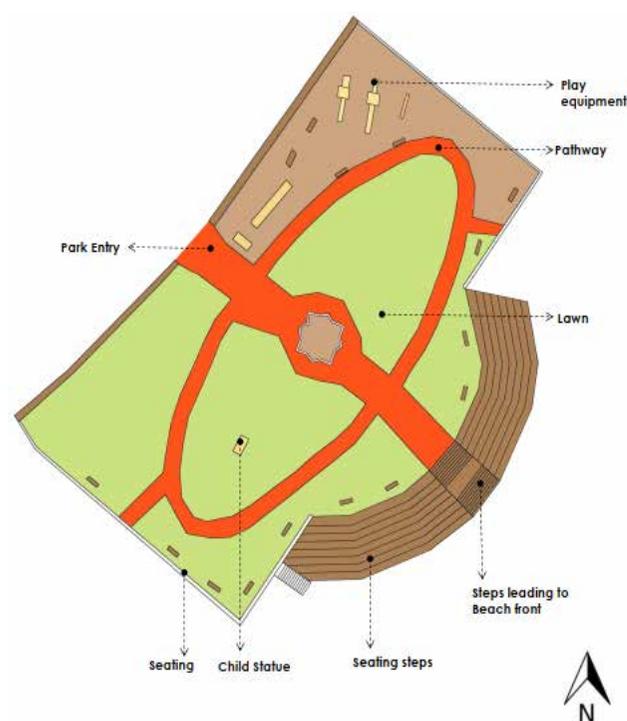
The All Abilities Park at Beach Road, Visakhapatnam: The Basic Layout Plan. Source: GVSCCL
